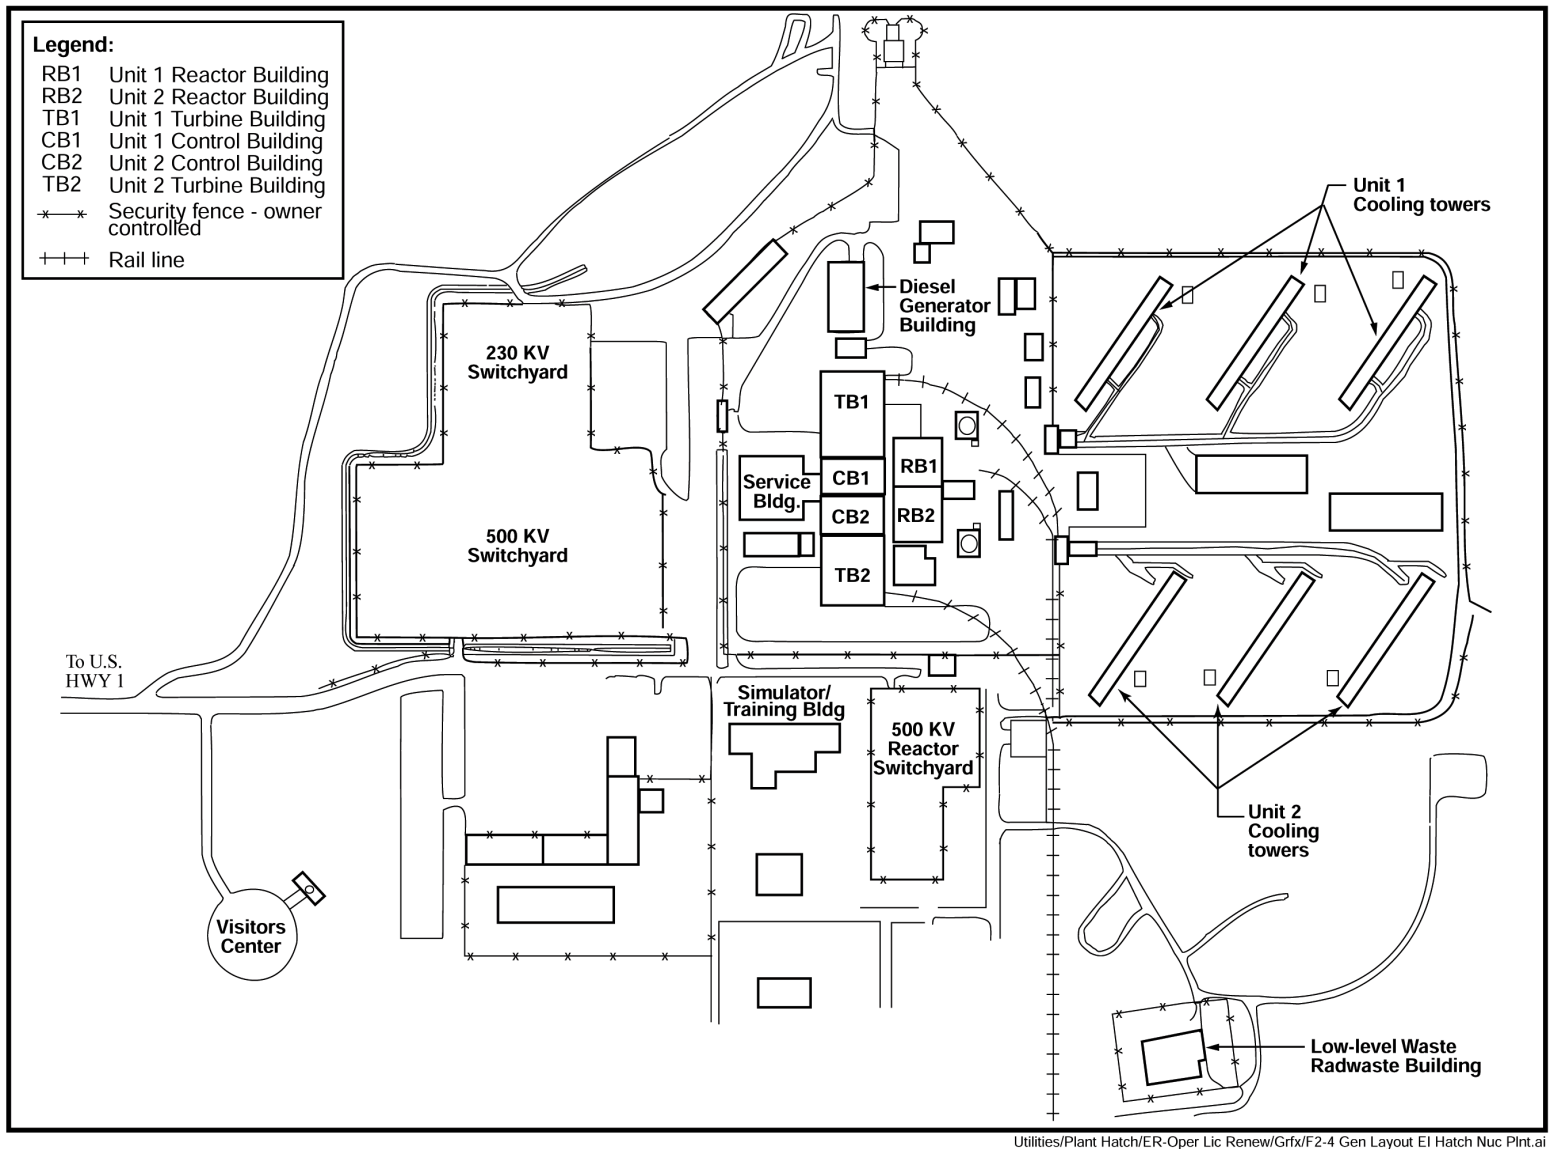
Edwin I. Hatch Nuclear Plant site plan.
